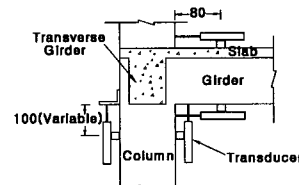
Dimension and location of transducers to measure angular rotations (unit : mm)
